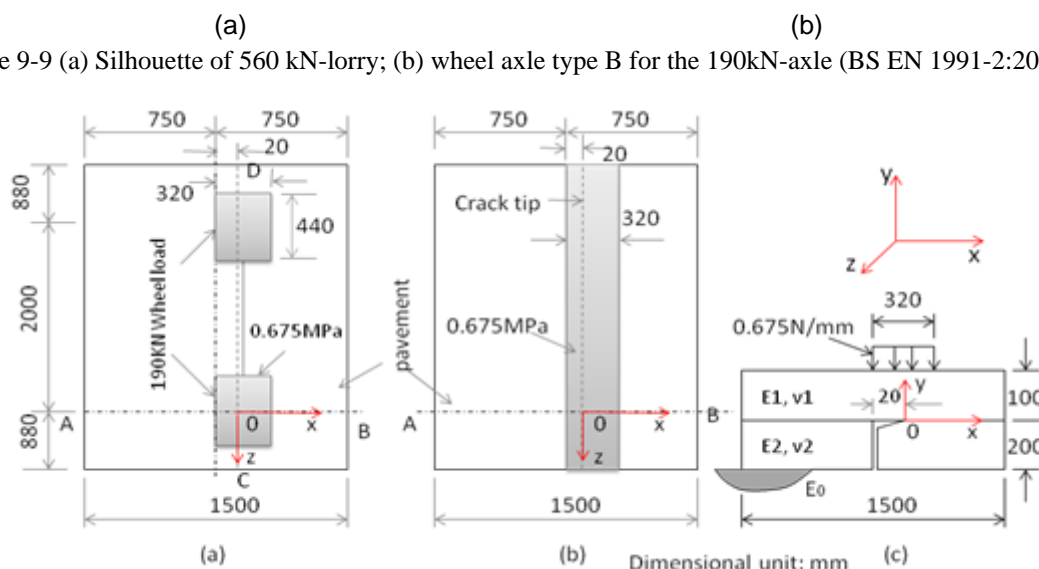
(a) Overlay pavement system subjected to a 190kN-axle loading of 560kN-lorry; (b) a lane width pavement subjected to pressure load through the width, (c) simplified model for loading mode (b)
